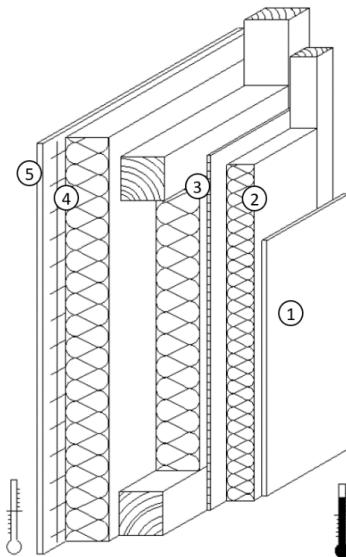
Layered structure of variant 2 - Wood frame construction [LEGEPE]
